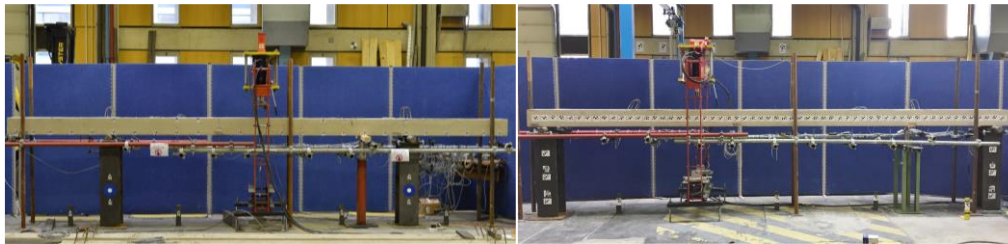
Laboratory experiment setups, beam with cantilever (left) [13] and single span beam (right) [14]
